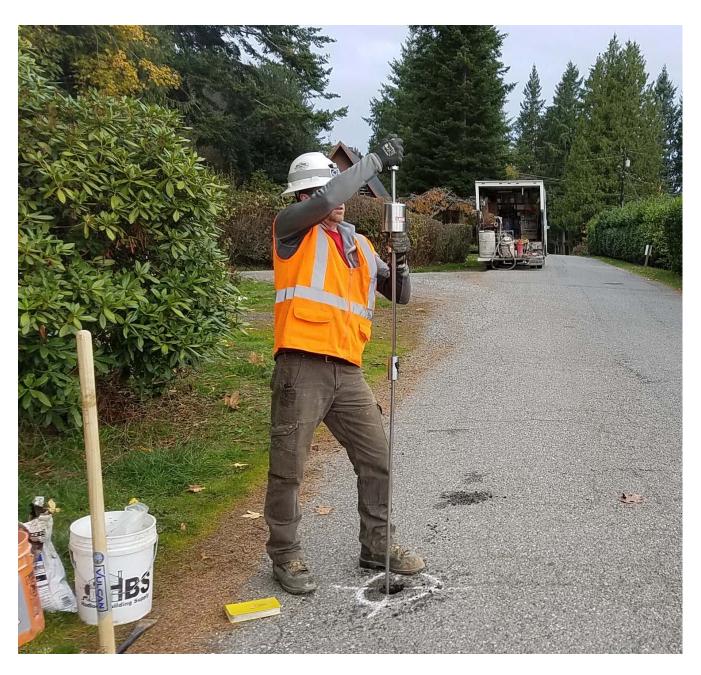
Photo F: Facing west on 78<sup>th</sup> Place NW near core/kDCP C-7. Photo displays some of the more significant road damage on the right with a manhole and utility corridor running parallel to the roadway in slightly better condition.
